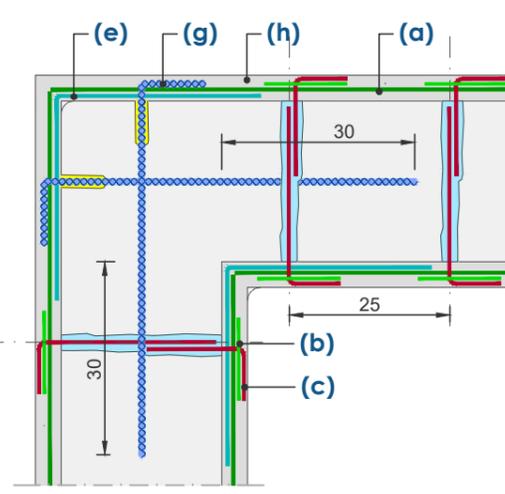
DETAIL OF MASON'S MALE CONNECTIONS - scale 1:10
